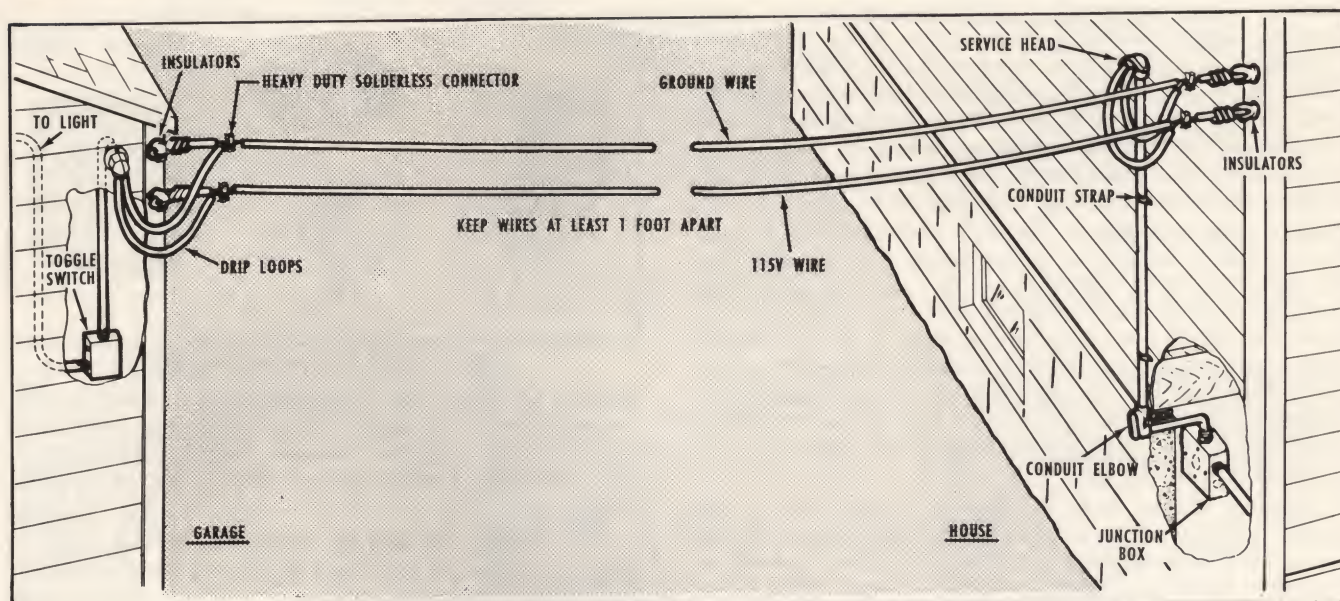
OVERHEAD WIRING BETWEEN HOUSE AND GARAGE OR OUTBUILDING
